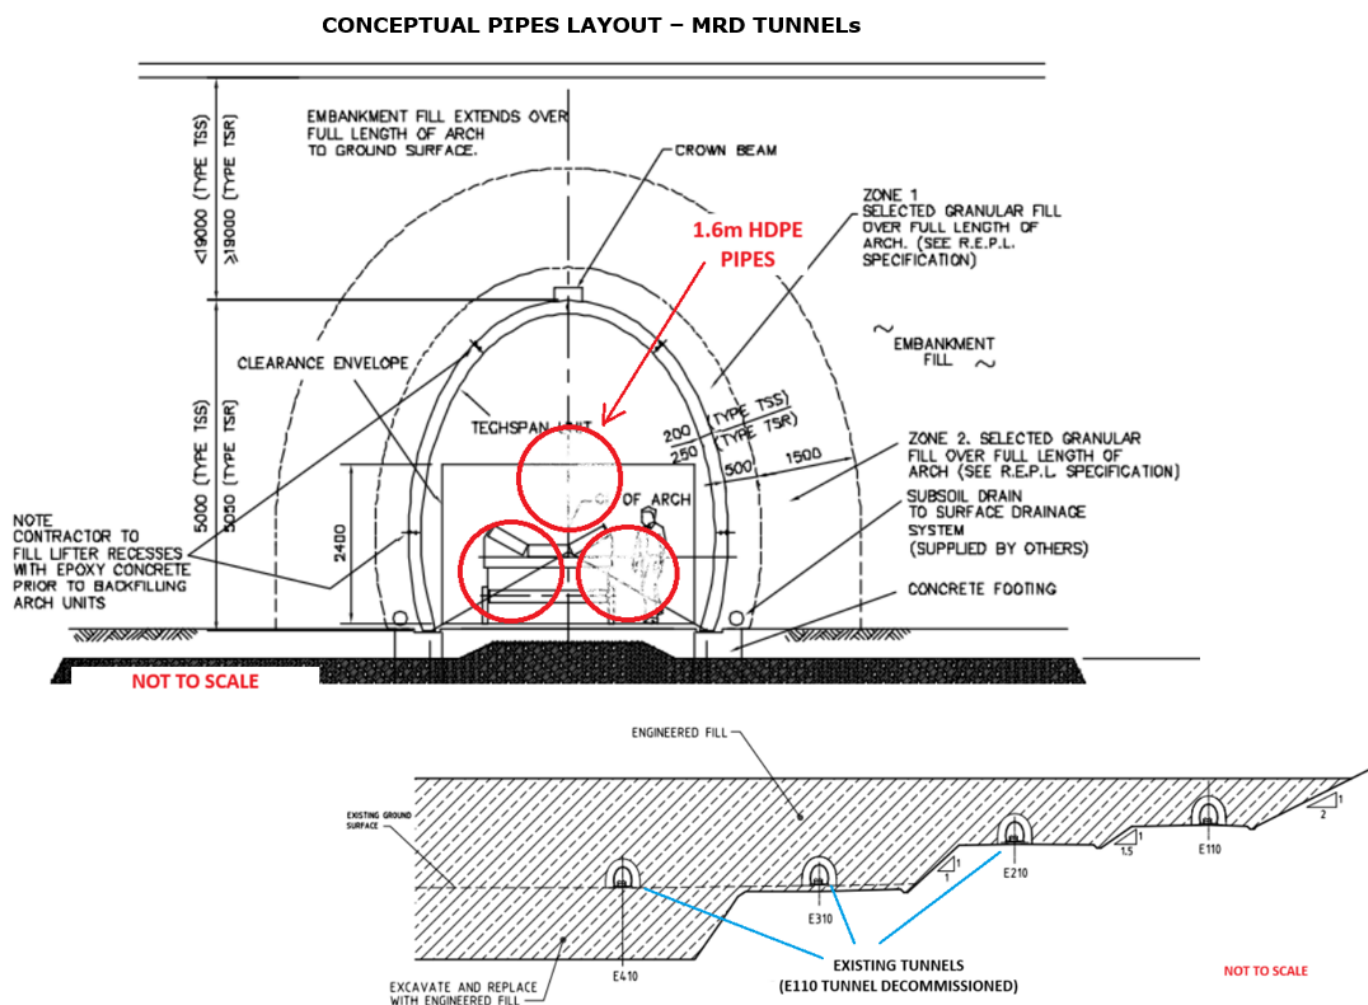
Conceptual Pipes Layout – MRD Tunnels (PSM 2025b)
